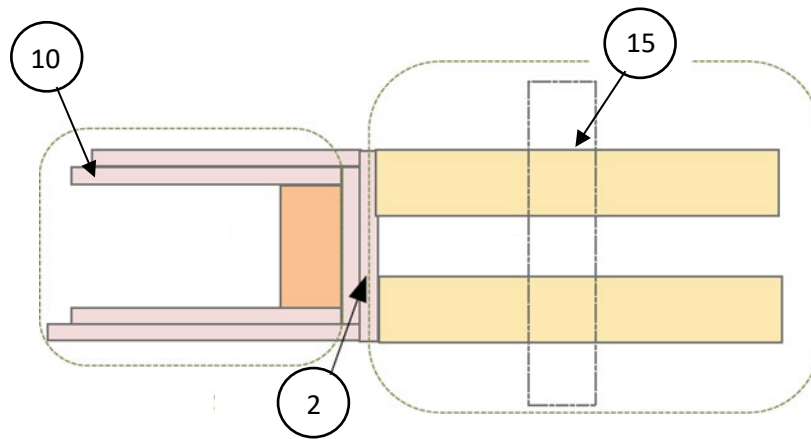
Batt system fitted to an opening in a wall – Plan view
